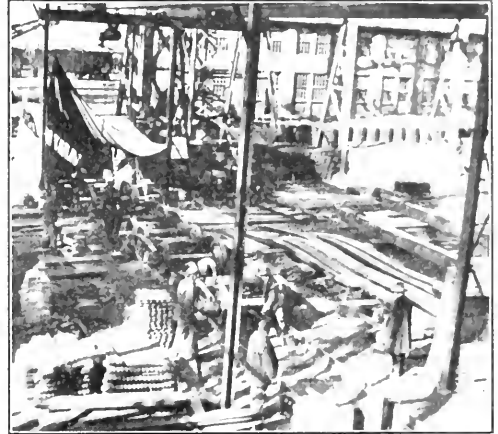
ERECTOR TRESTLE AT STA. 60, No. 1
